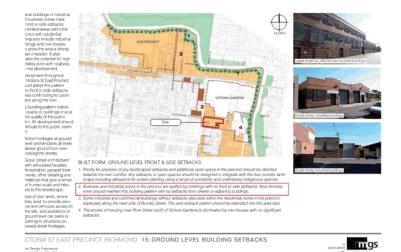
Ground Level Building Setbacks (Victoria Street East Precinct UDF)
